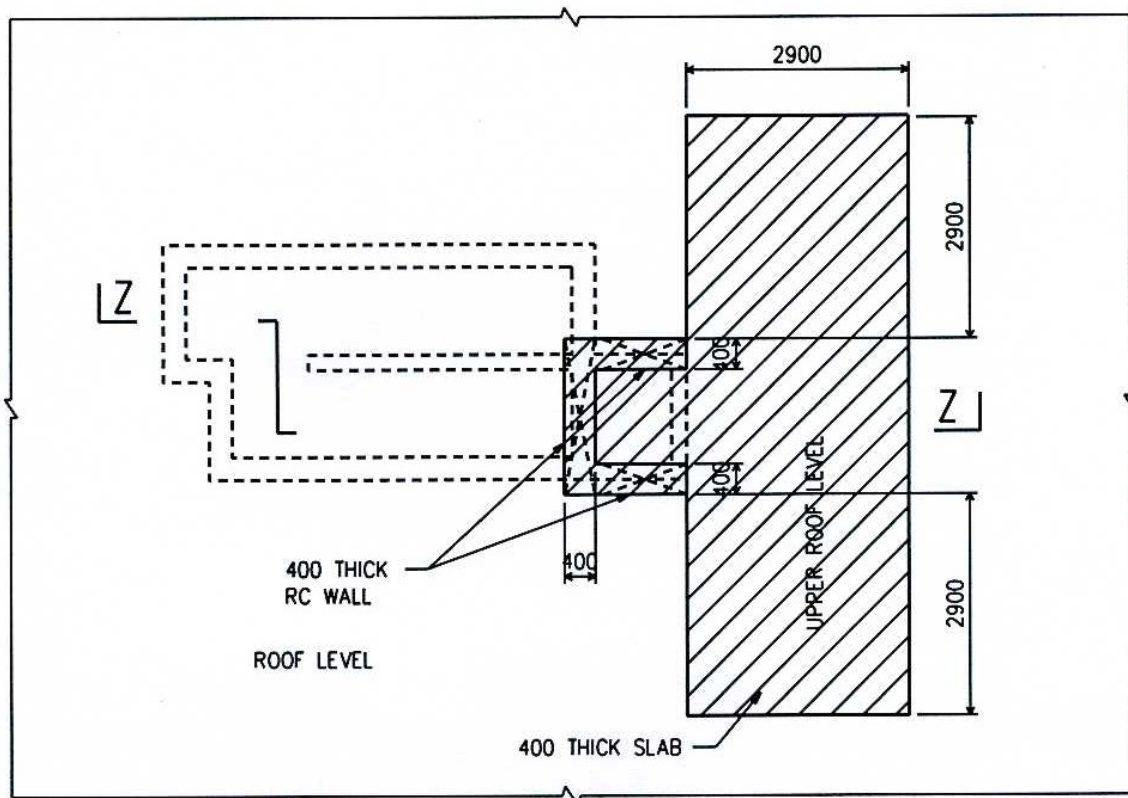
(b-6) PLAN OF STAIRCASE STOREY SHELTER AT UPPER ROOF LEVEL
